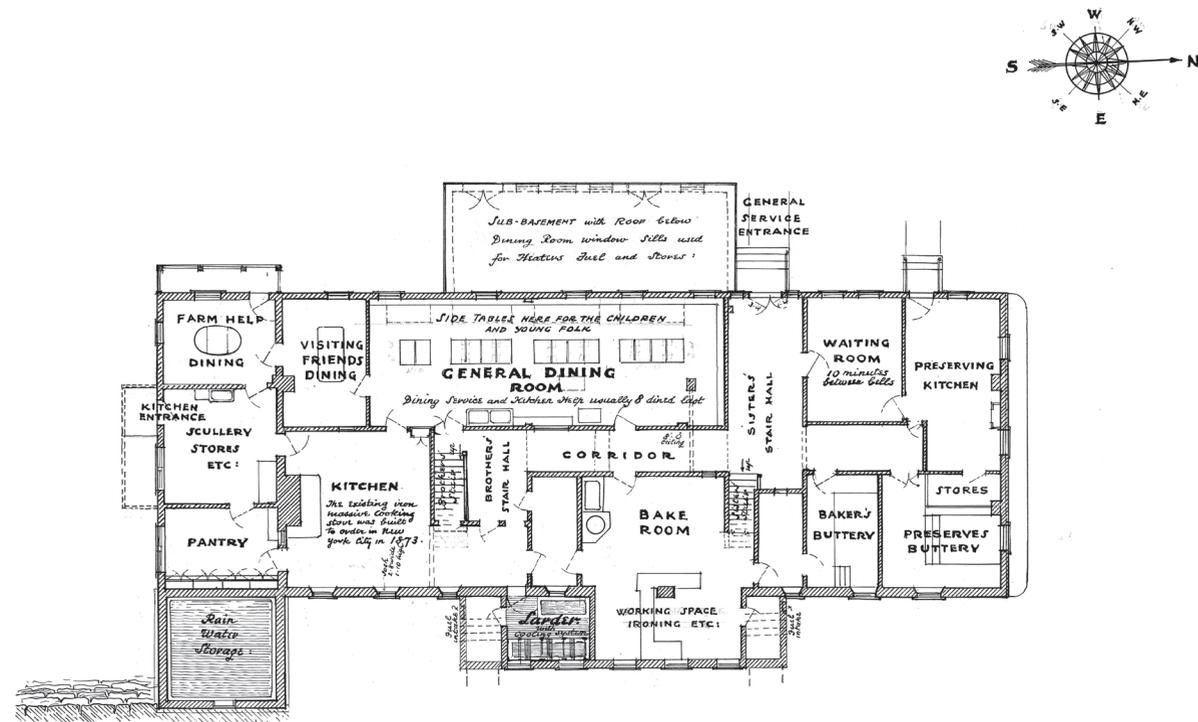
Dining room, Dwelling building, North Family, New Lebanon
